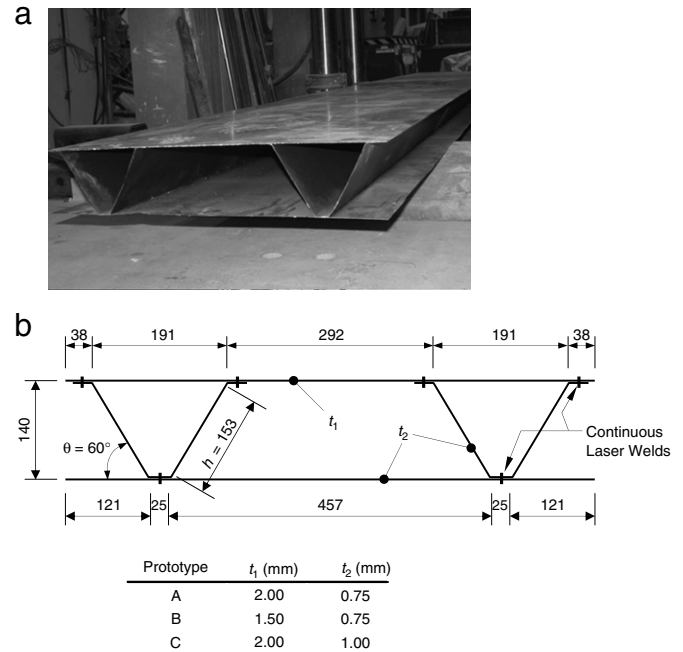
V-core panel: (a) overall view; and (b) cross-sectional dimensions. (Units in mm).
